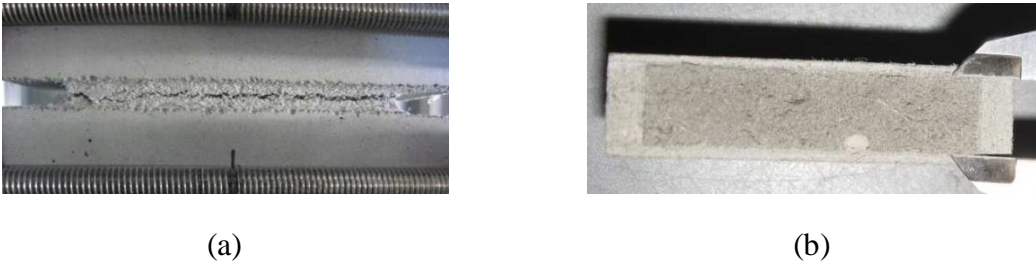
Fracture surface localized inside the notched portion of the specimens used to characterize single crack opening response of the composites (a) front view, and (b) sectional view of the fractured surface
